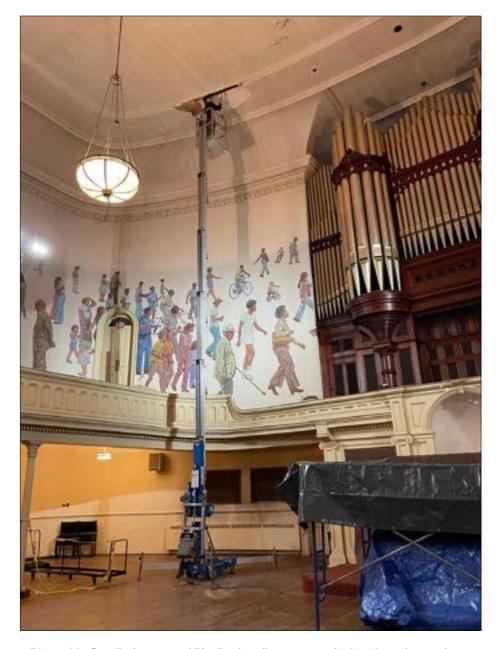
Detail of personnel lift allowing direct access for hands-on inspection.
